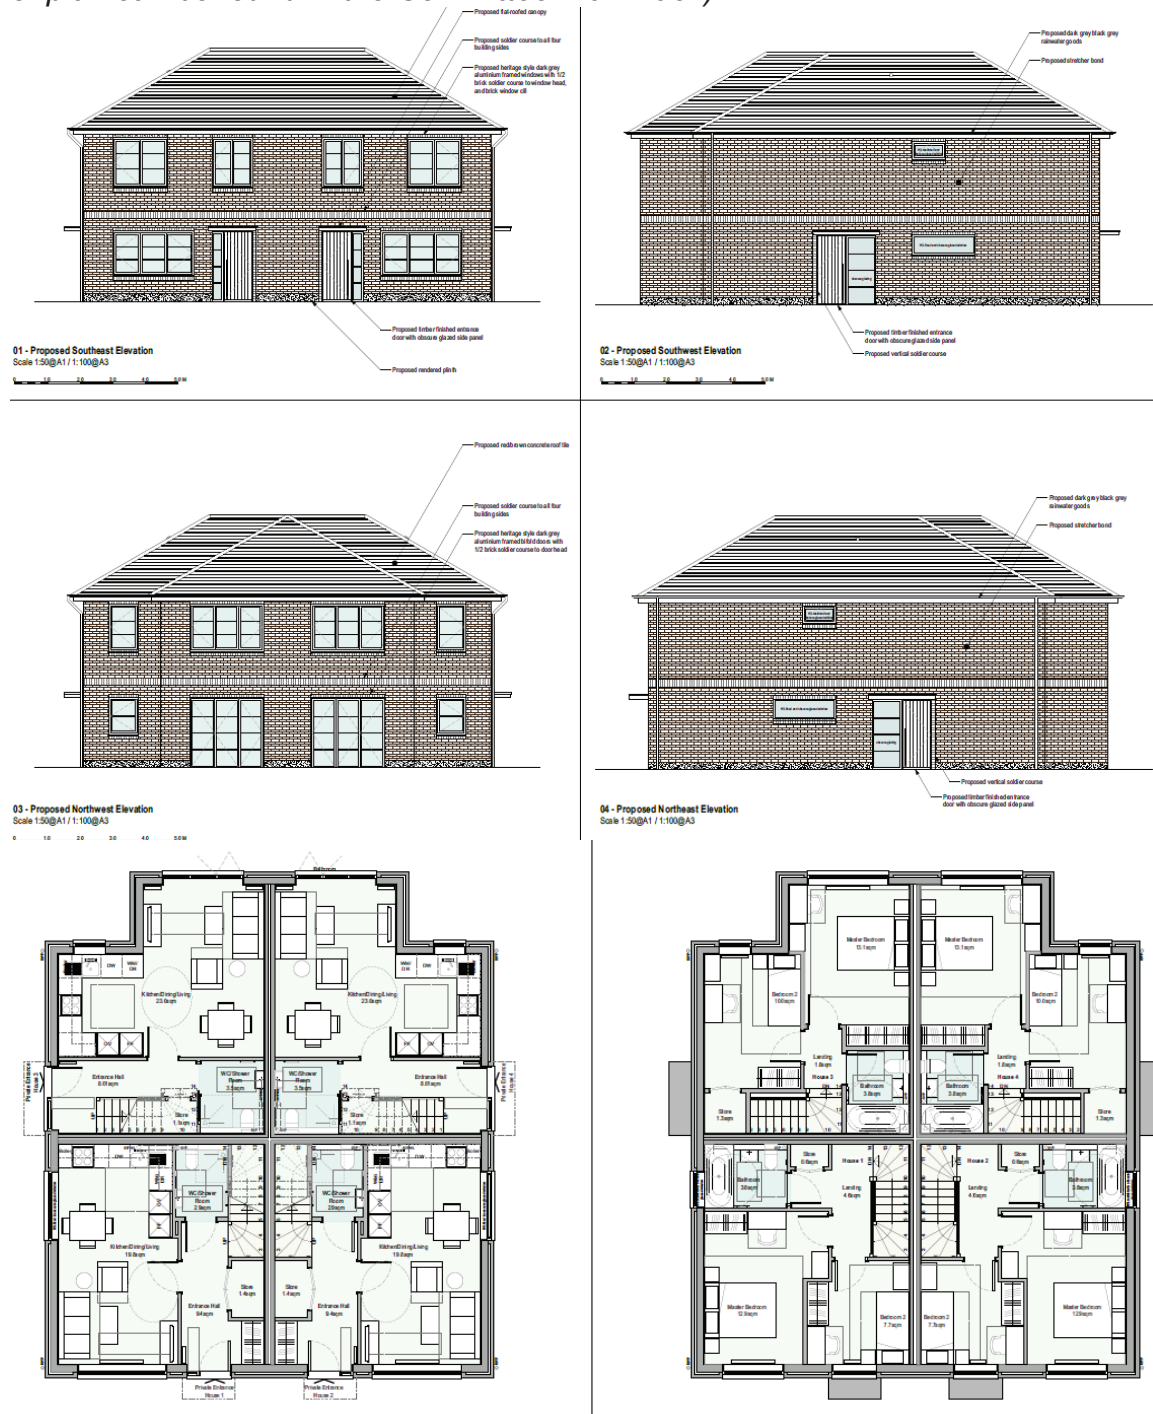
Proposed Elevations and Floor Plans (please note – larger version of plan can be found in the Committee Plan Pack)
